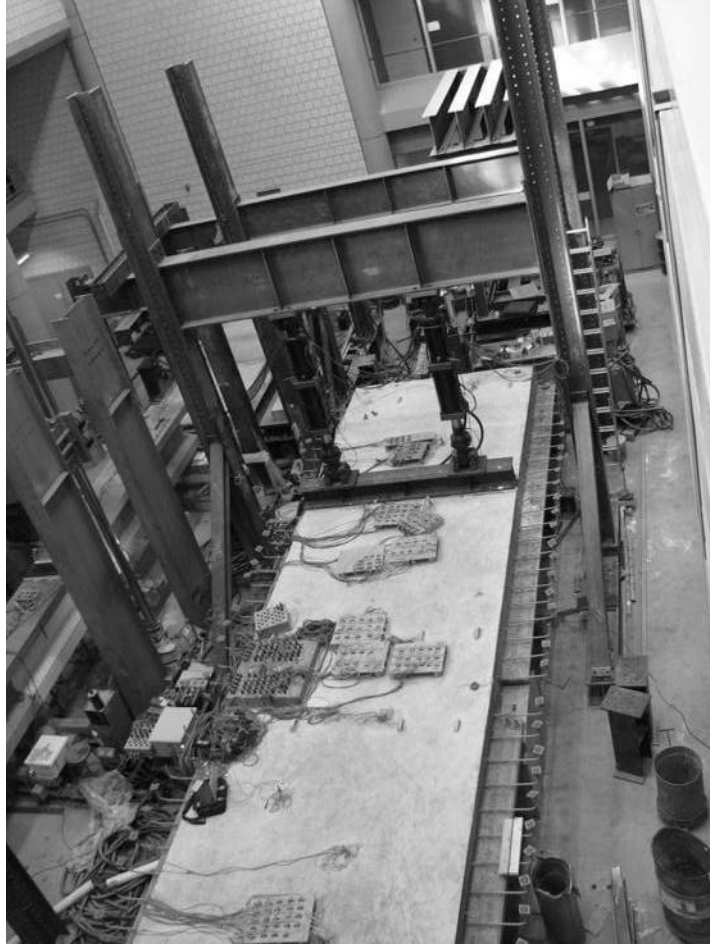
Laboratory bridge specimen during spreader beam test of Span 1
